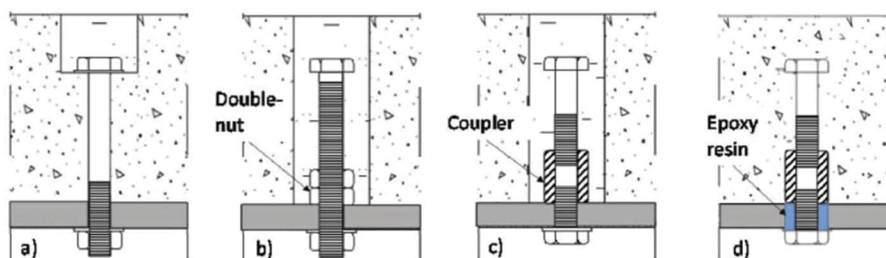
Types of demountable bolted connectors a) friction grip bolts, b) double-nut, c) coupler system connectors, d) injected bolted shear connectors with a coupler system [44]
